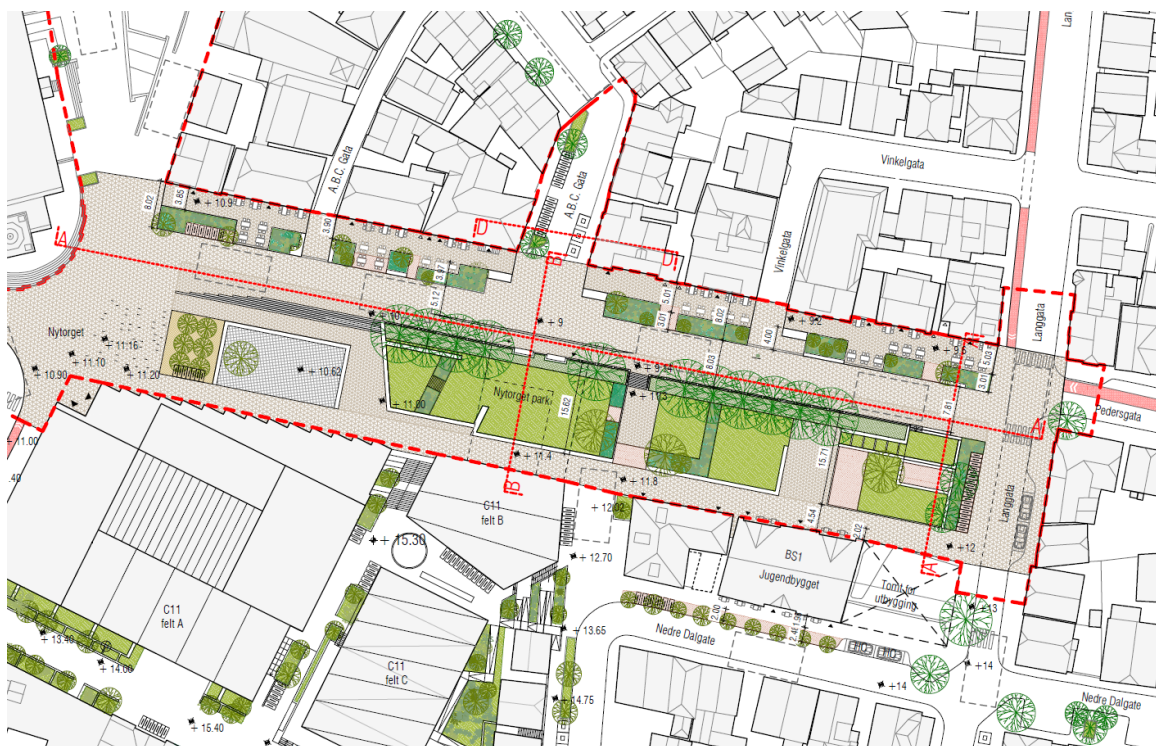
Nytorget – proposed plan (source: Ghilardi+Hellsten Architects)
